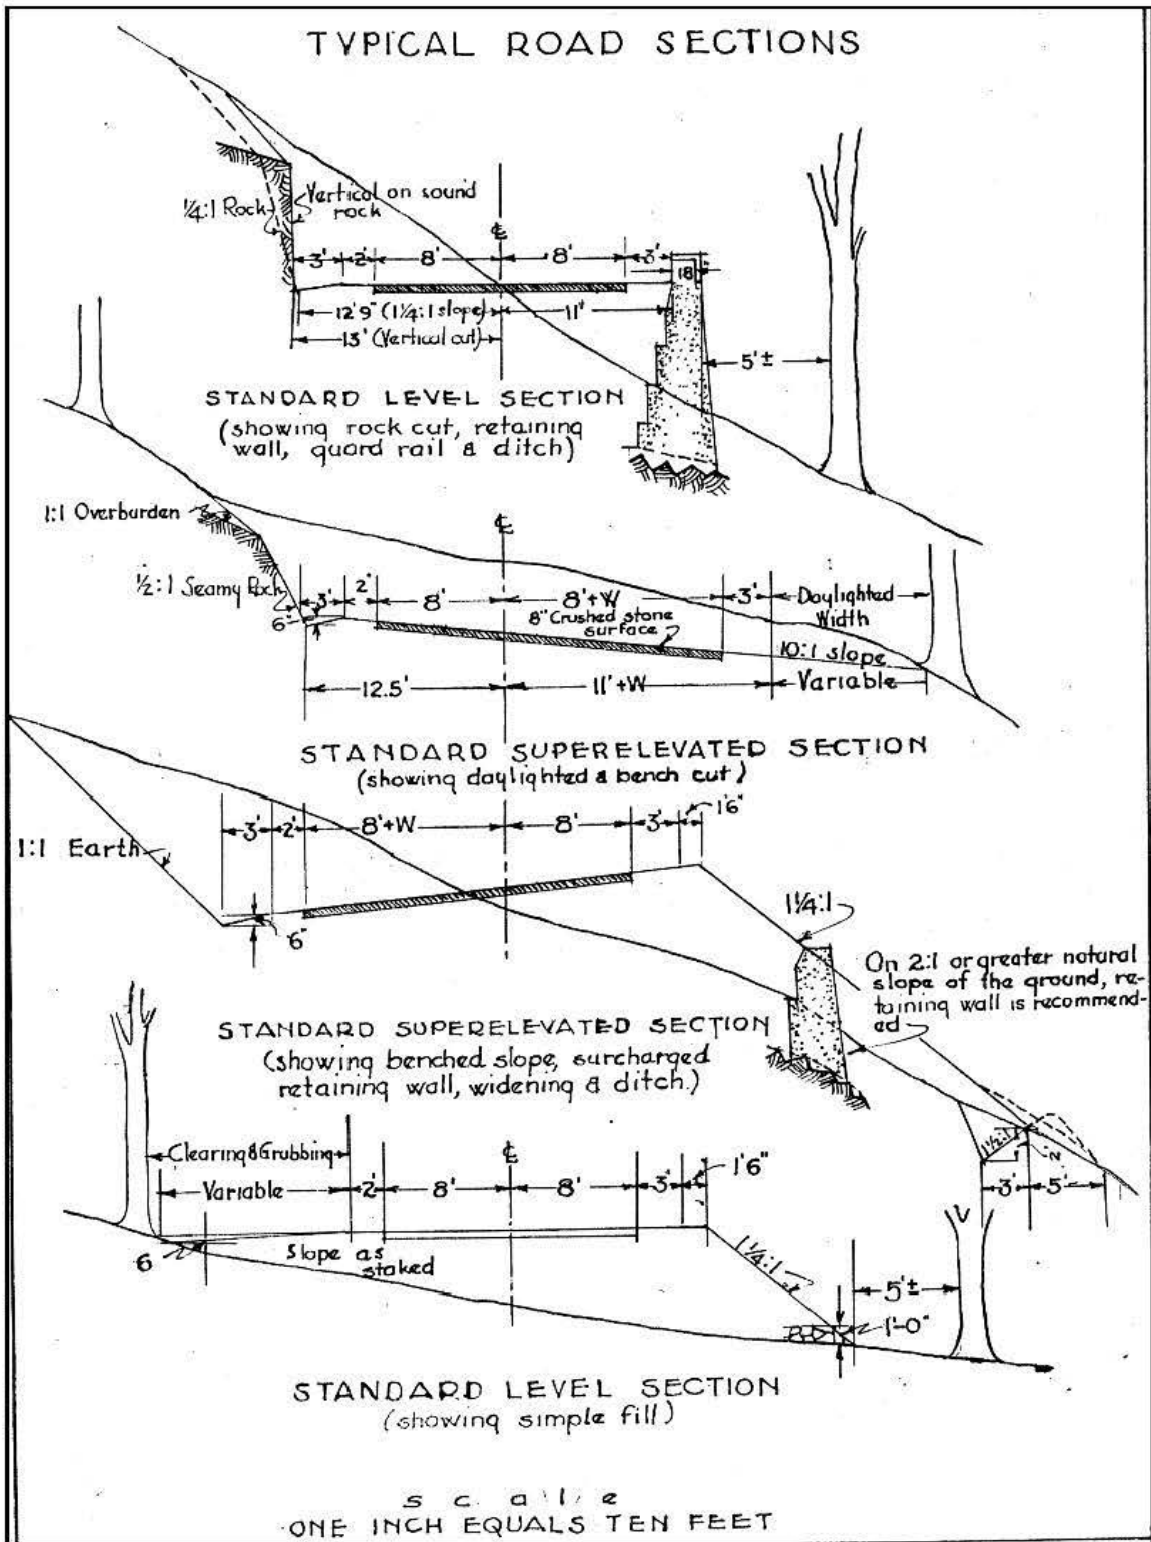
"Typical Road Sections (General Construction Notes, 1935).
